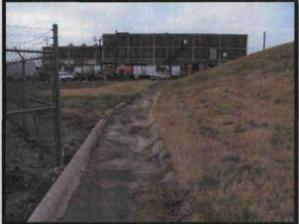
Concrete drainage swale along southern slope of Taracorp pile.
